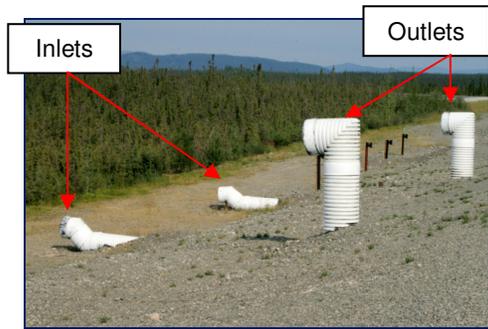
Inlets and outlets of the longitudinal culvert system (section 7).
